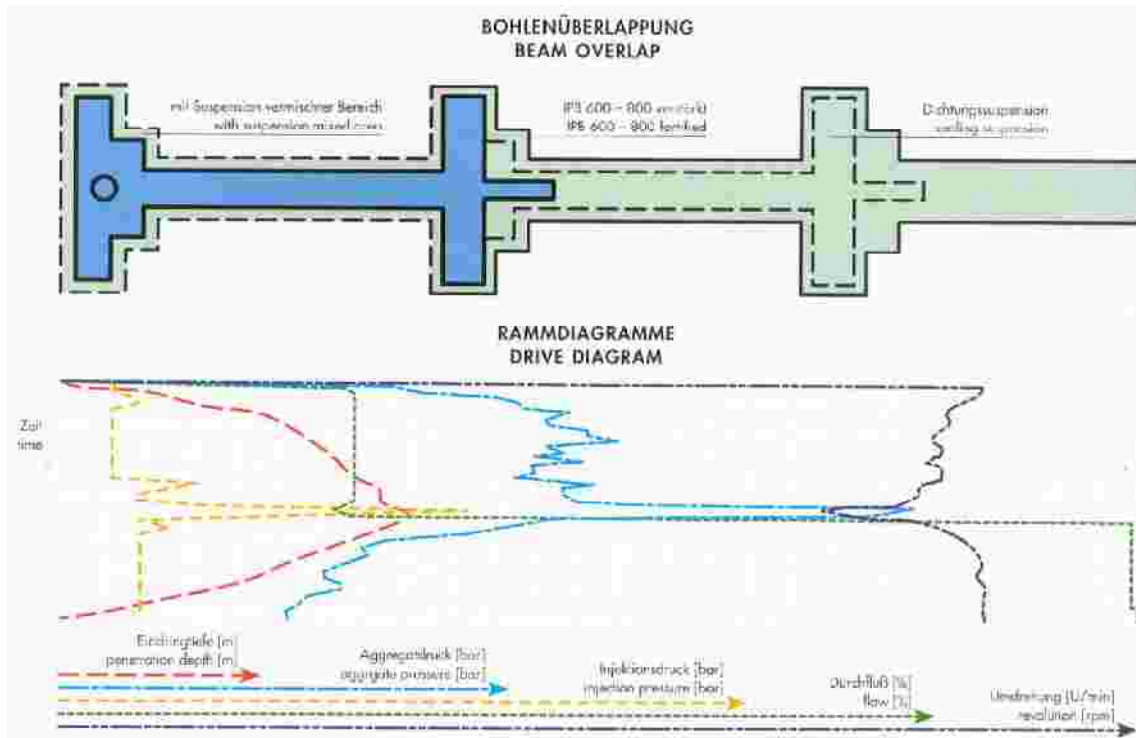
Example of a record of parameters relevant in the production of a vibrated wall element
